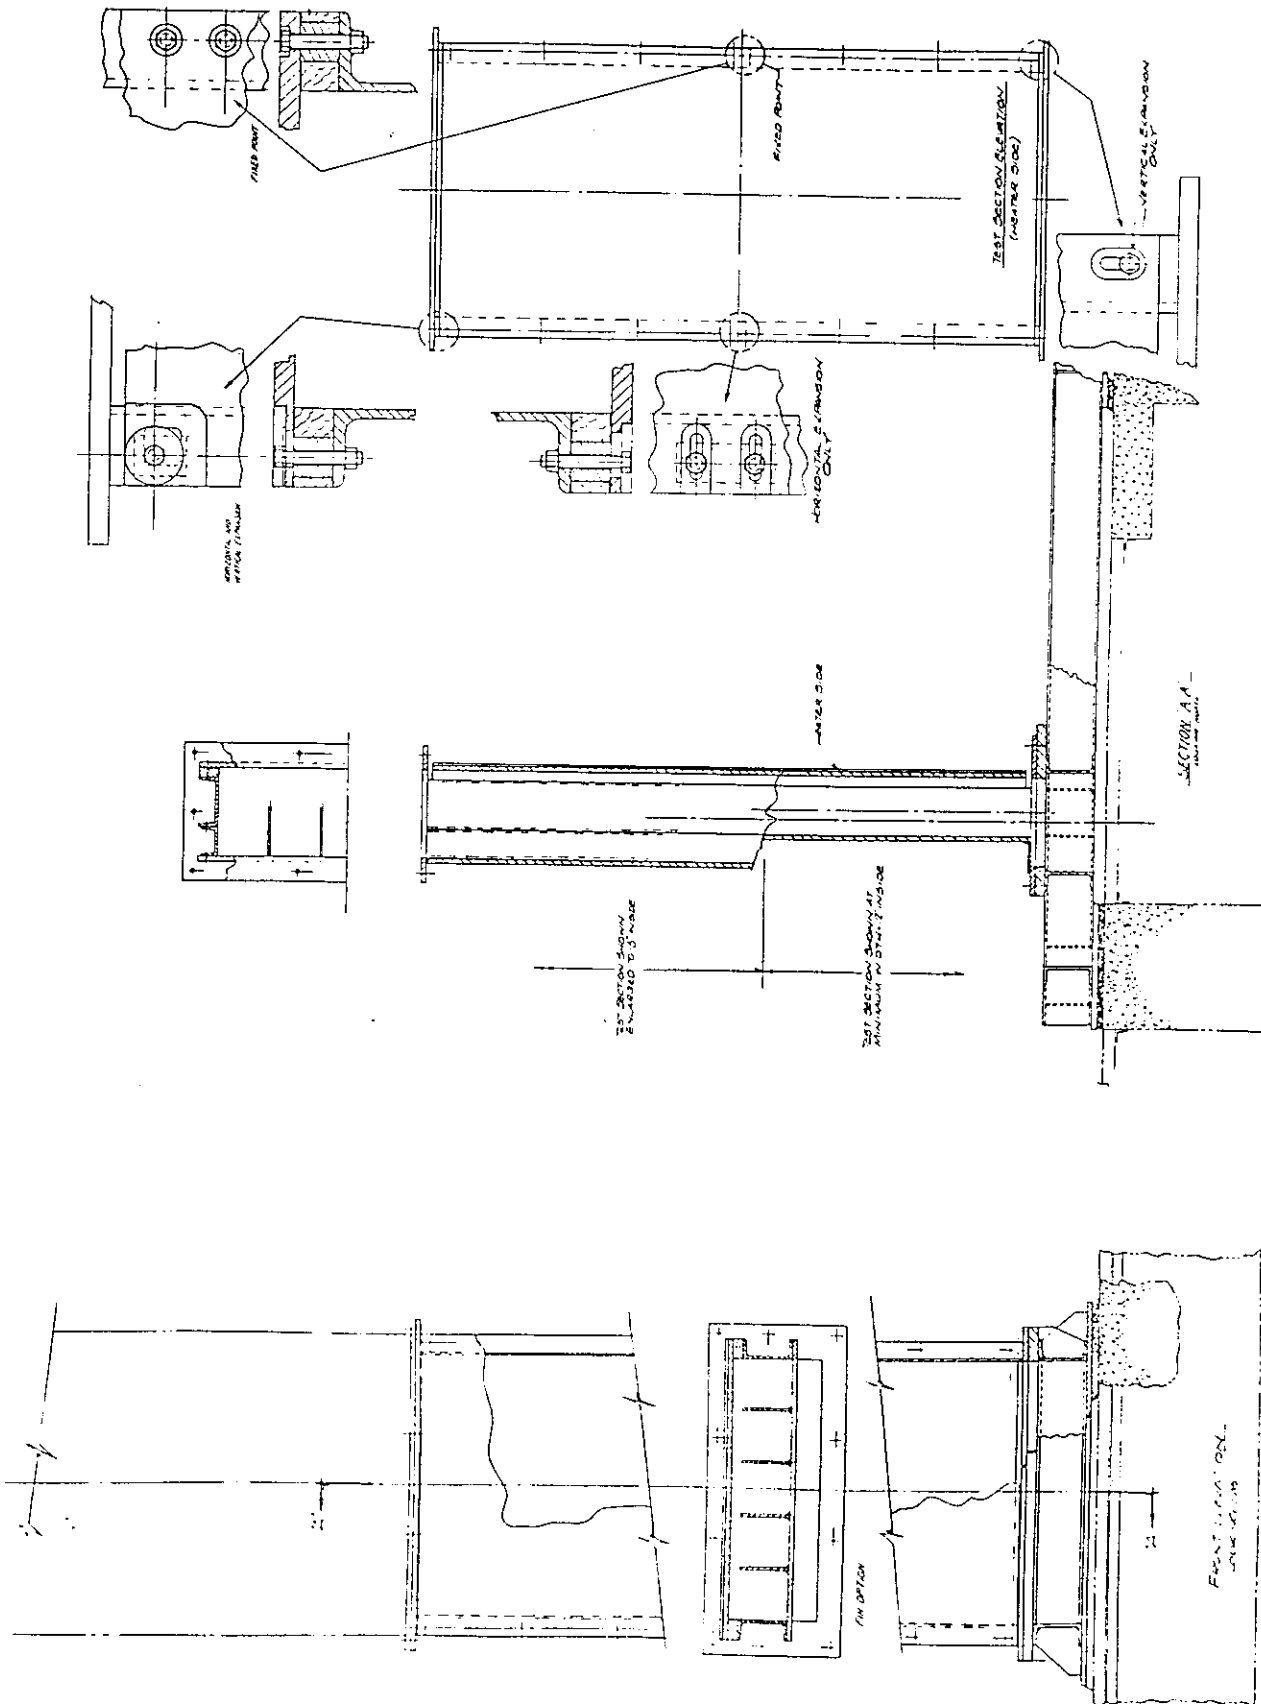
Test Section Layout (Fins on Duct Wall Not Included in Current Design).
